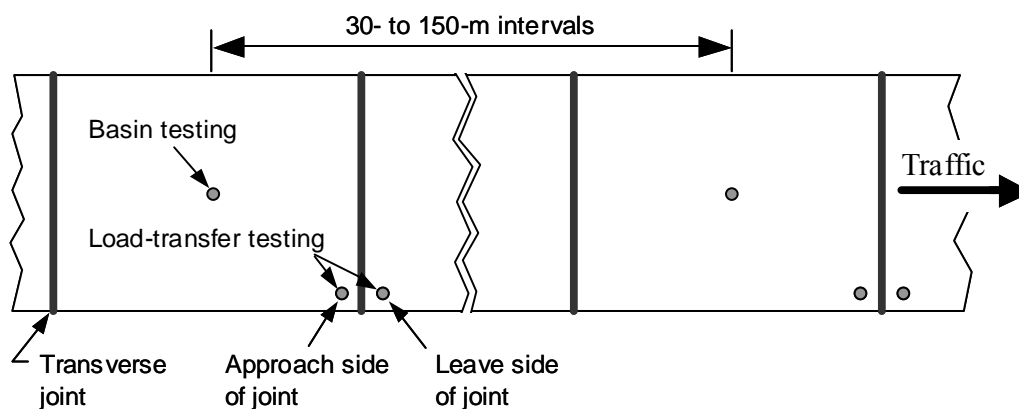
Recommended deflection testing locations for jointed concrete pavements.
